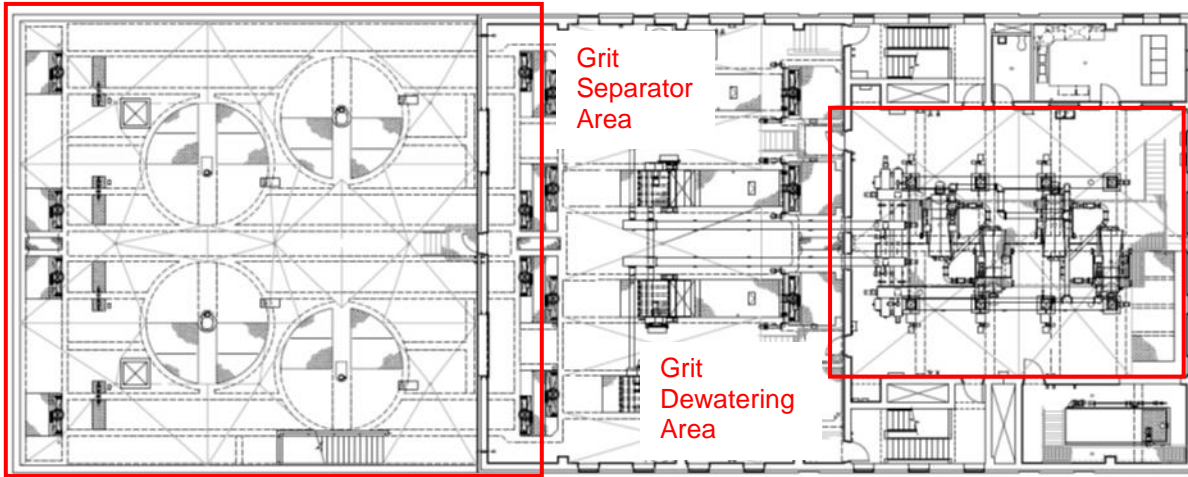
Existing Building K Plan with Grit Separator and Dewatering Areas Highlighted
